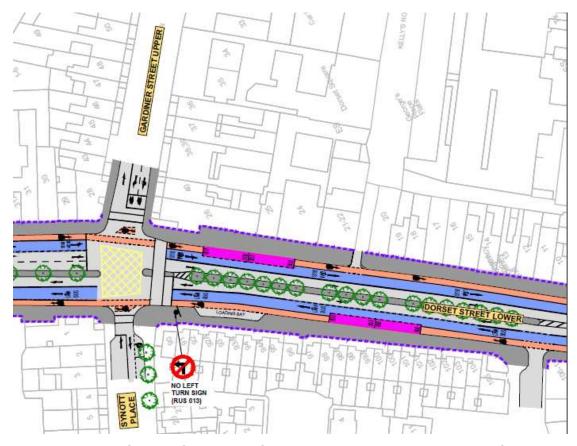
Gardiner Street Upper/Synott Place to Hardwicke Place/Eccles Street
